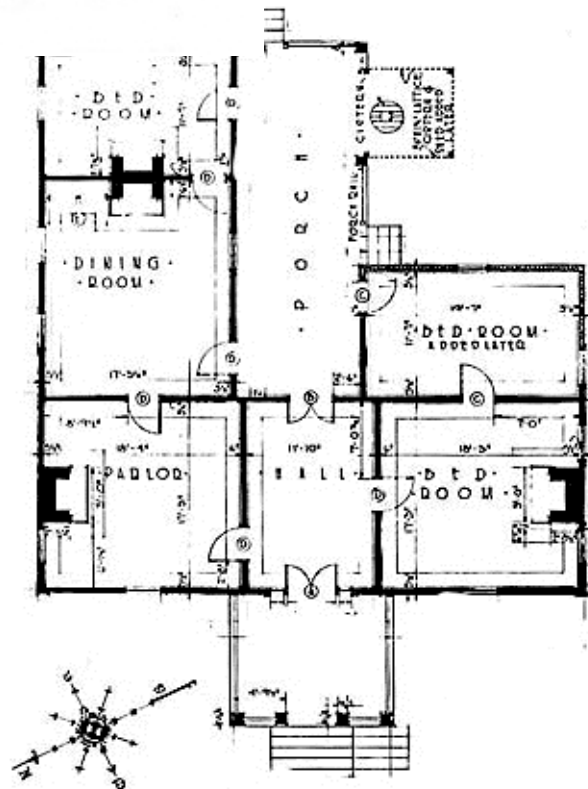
Floor Plan of The Elihu Kirby House, Henrietta, New York (top)
